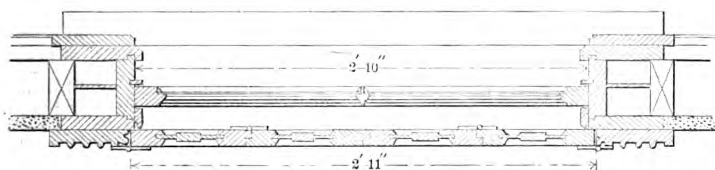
Horizontal Section through the Shutters.—Scale, 1 Inch to the Foot.
